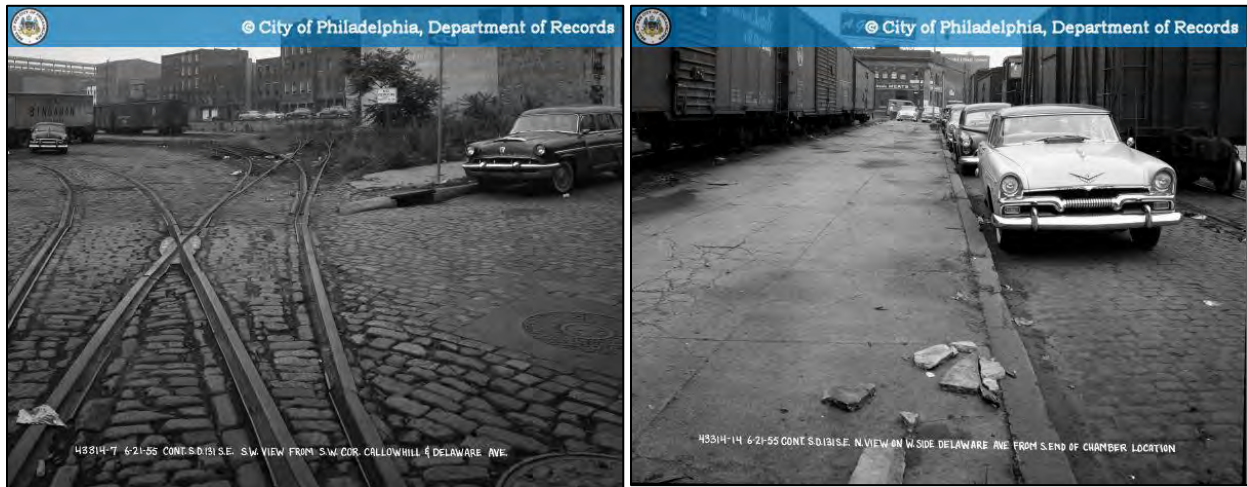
A view looking southwest at the Vine Street lot from the southwest corner of Delaware Avenue and Callowhill (left). A view of Delaware Avenue facing north, showing its relationship to the railyard and sidewalk (right). (Philadelphia Department of Records Public Works 43313-14-33296 and Public Works 43313-14-33290).
